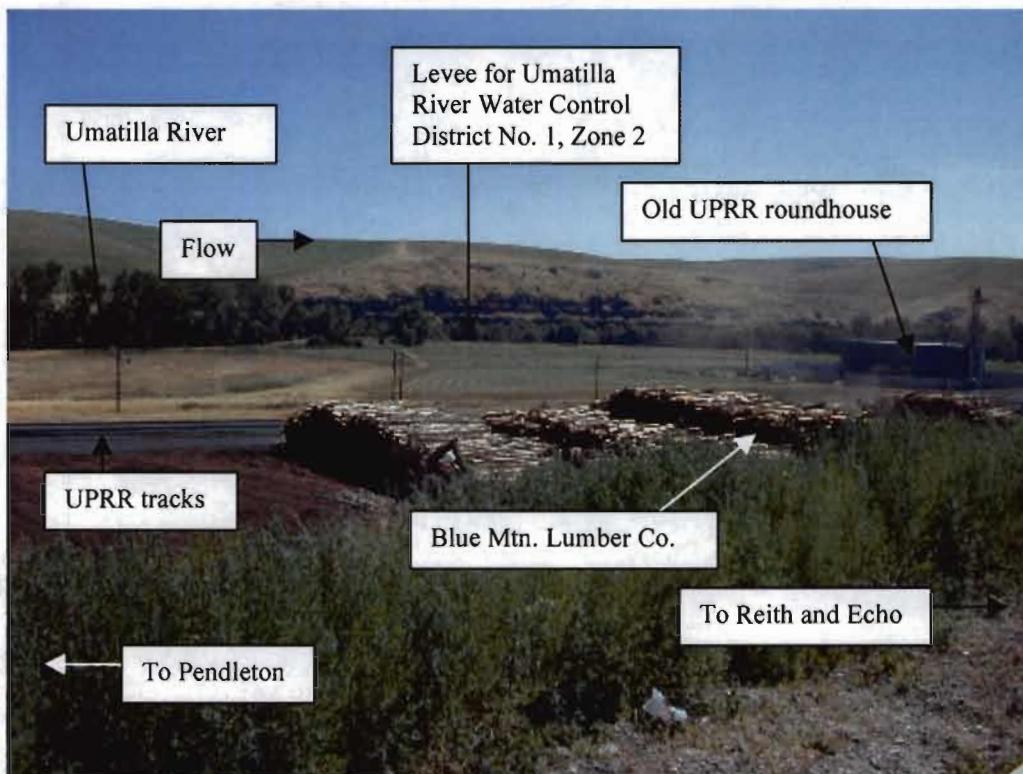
View looks southwest at Blue Mountain Lumber Co. and area protected by Seg. 3 of the URWCD1Z2 levee (around old UPRR roundhouse at Reith).
